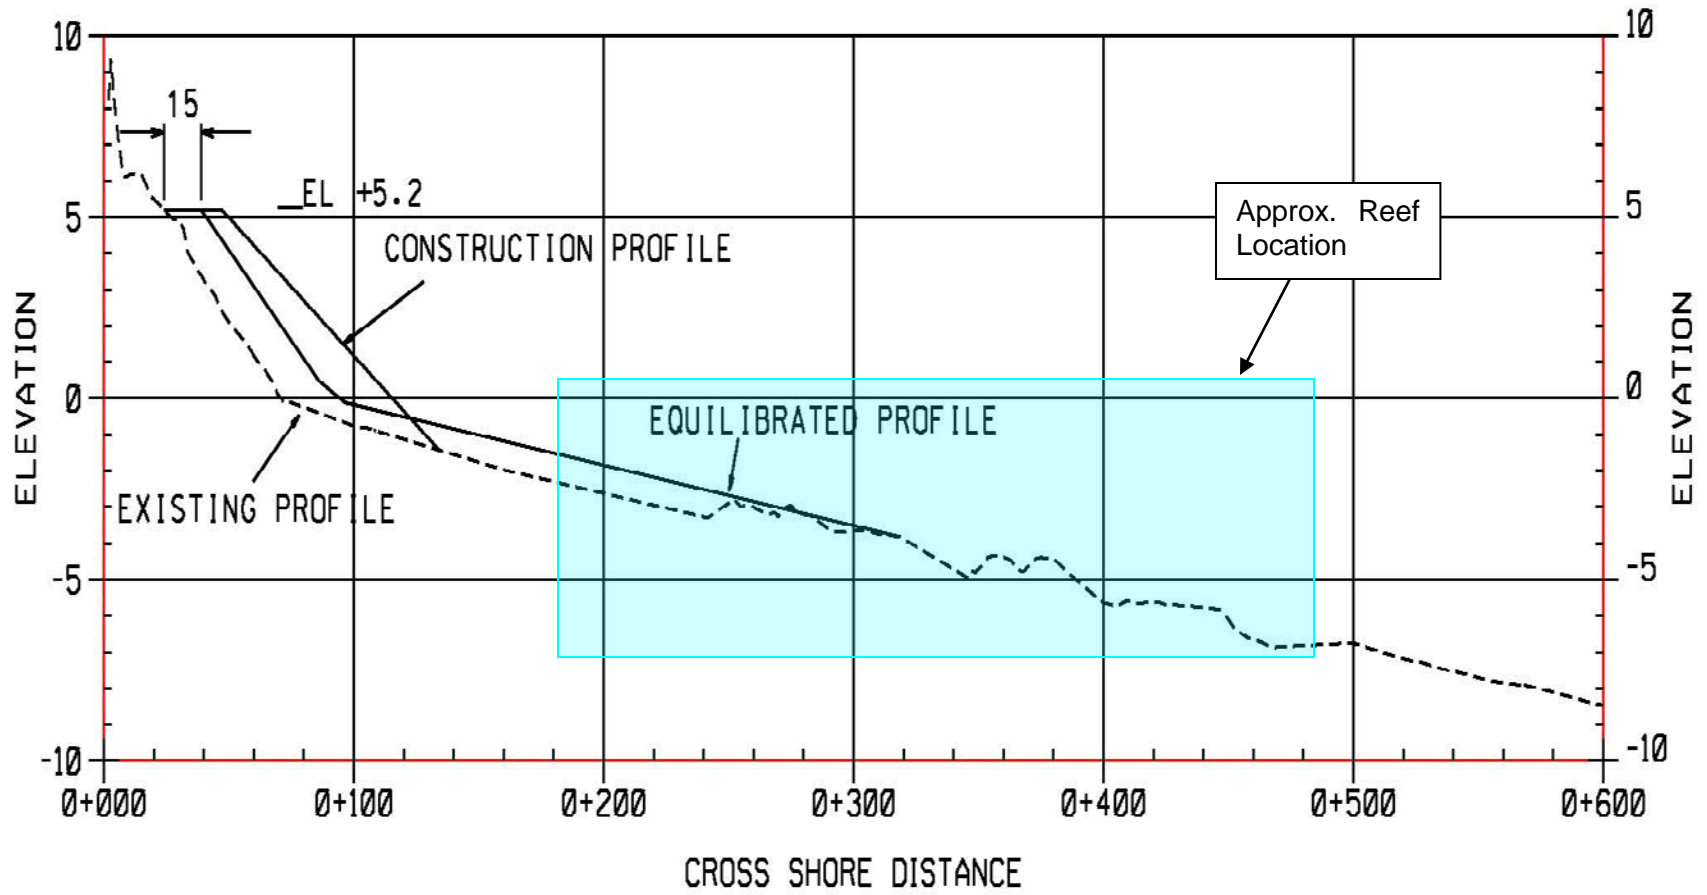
Cross Section Beach Fill of Recommended Plan
